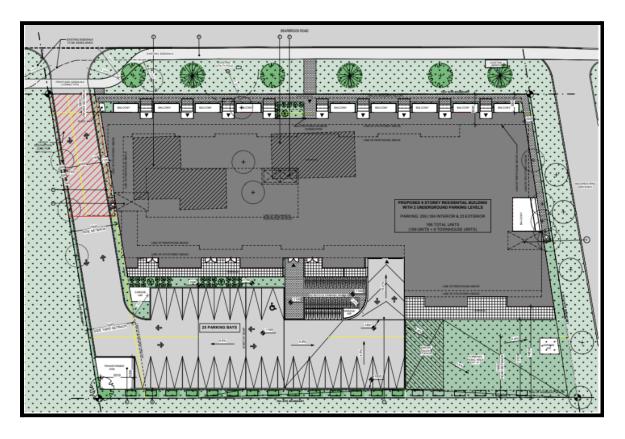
Site Plan extract. Bearbrook Road at the top of the figure
